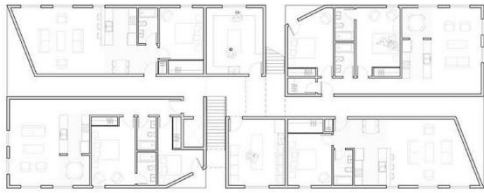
4th floor plan showing 4 quadrants created by stair and walkways.
